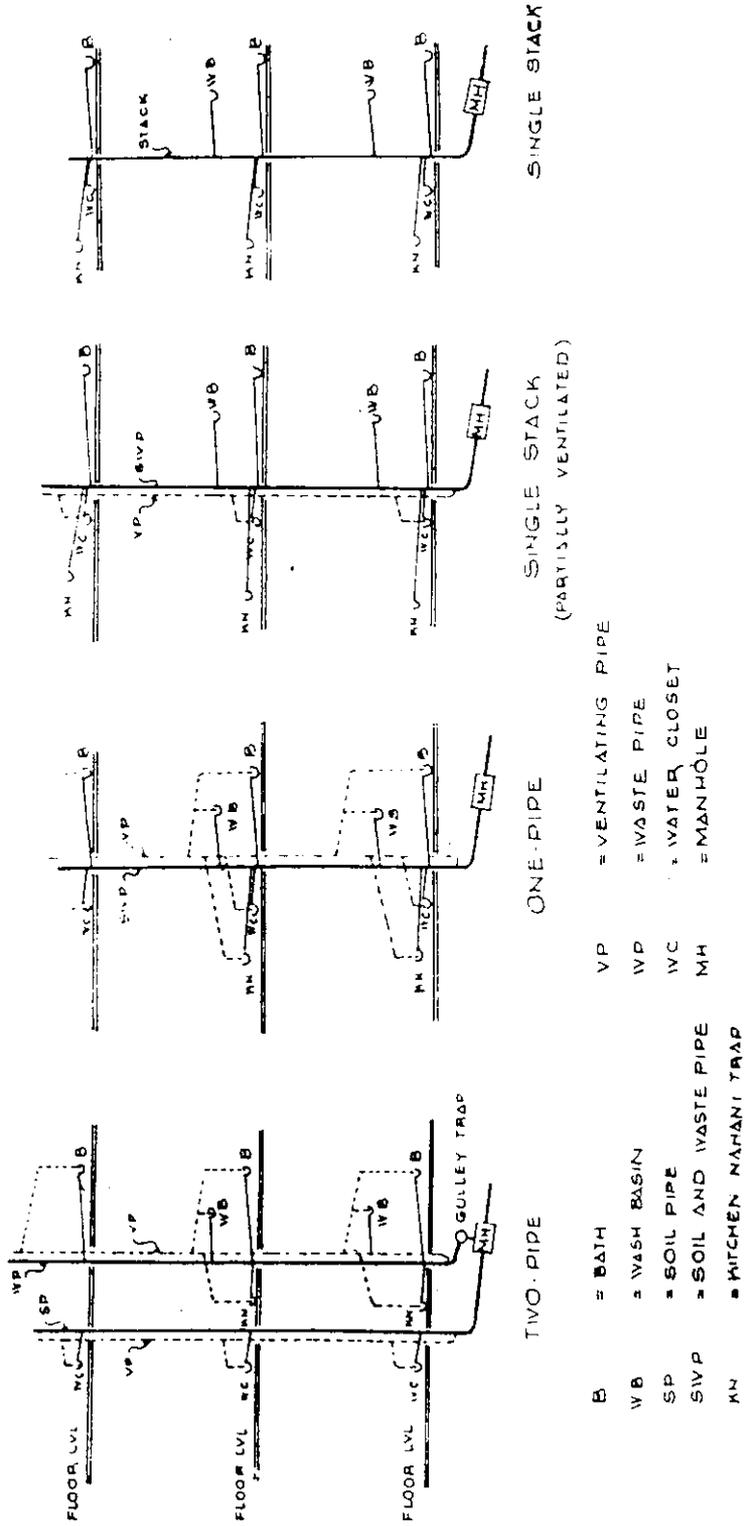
TYPICAL DRAINAGE SYSTEM.
